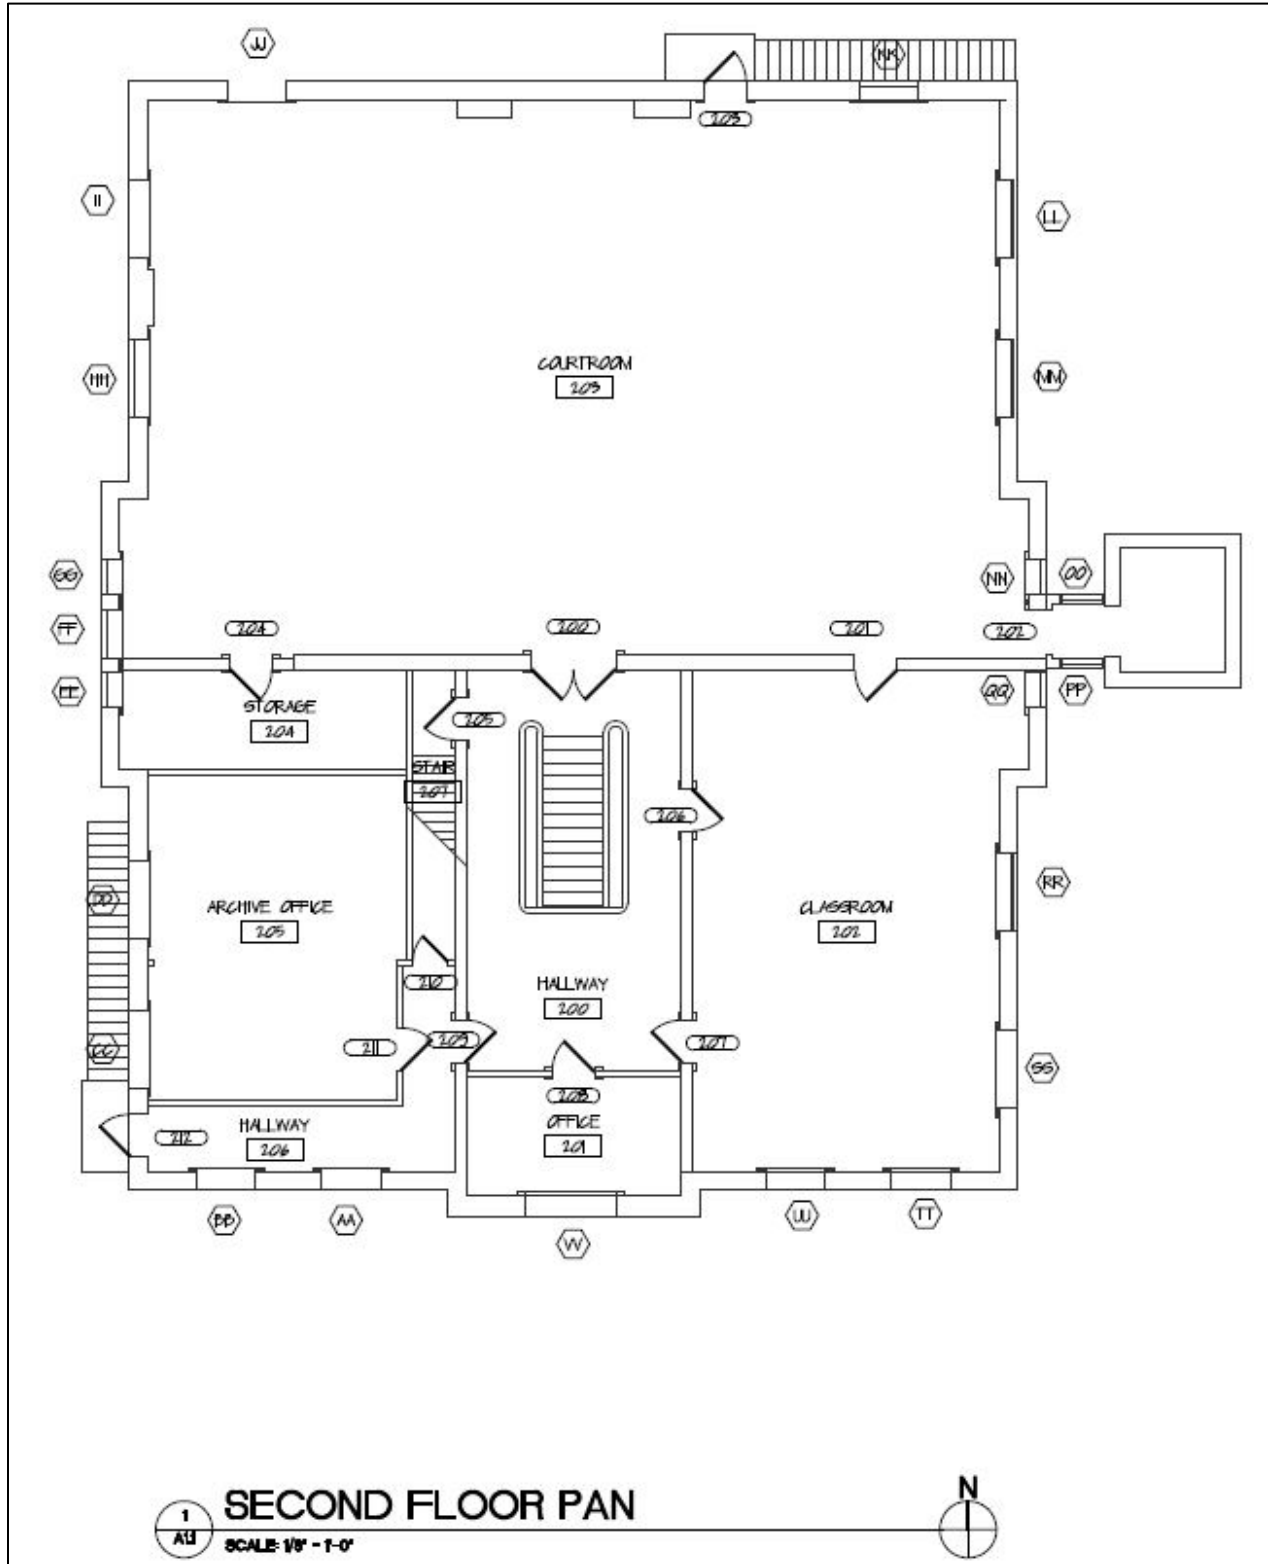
Courthouse, Second Story Floorplan, Scheuber + Darden, *Courthouse Historic Structure Assessment* (2018).
